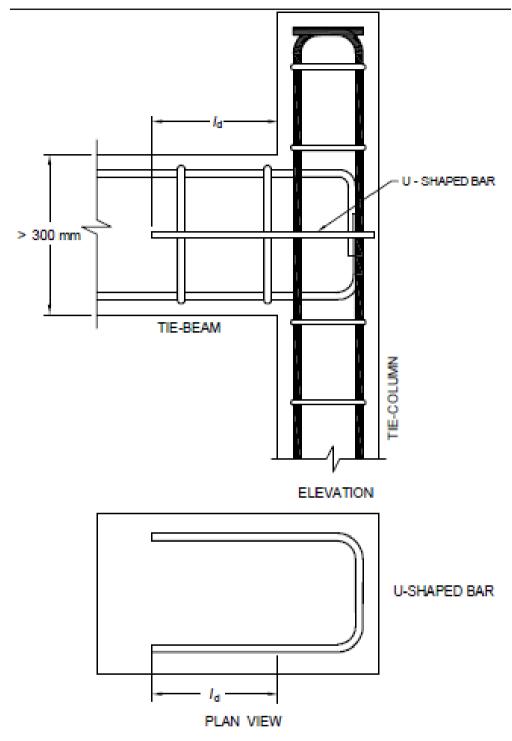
ADDITIONAL CONFINEMENT FOR VERTICAL REINFORCEMENT IN THE TIE-BEAM AND TIE-COLUMN END JOINT REGION
